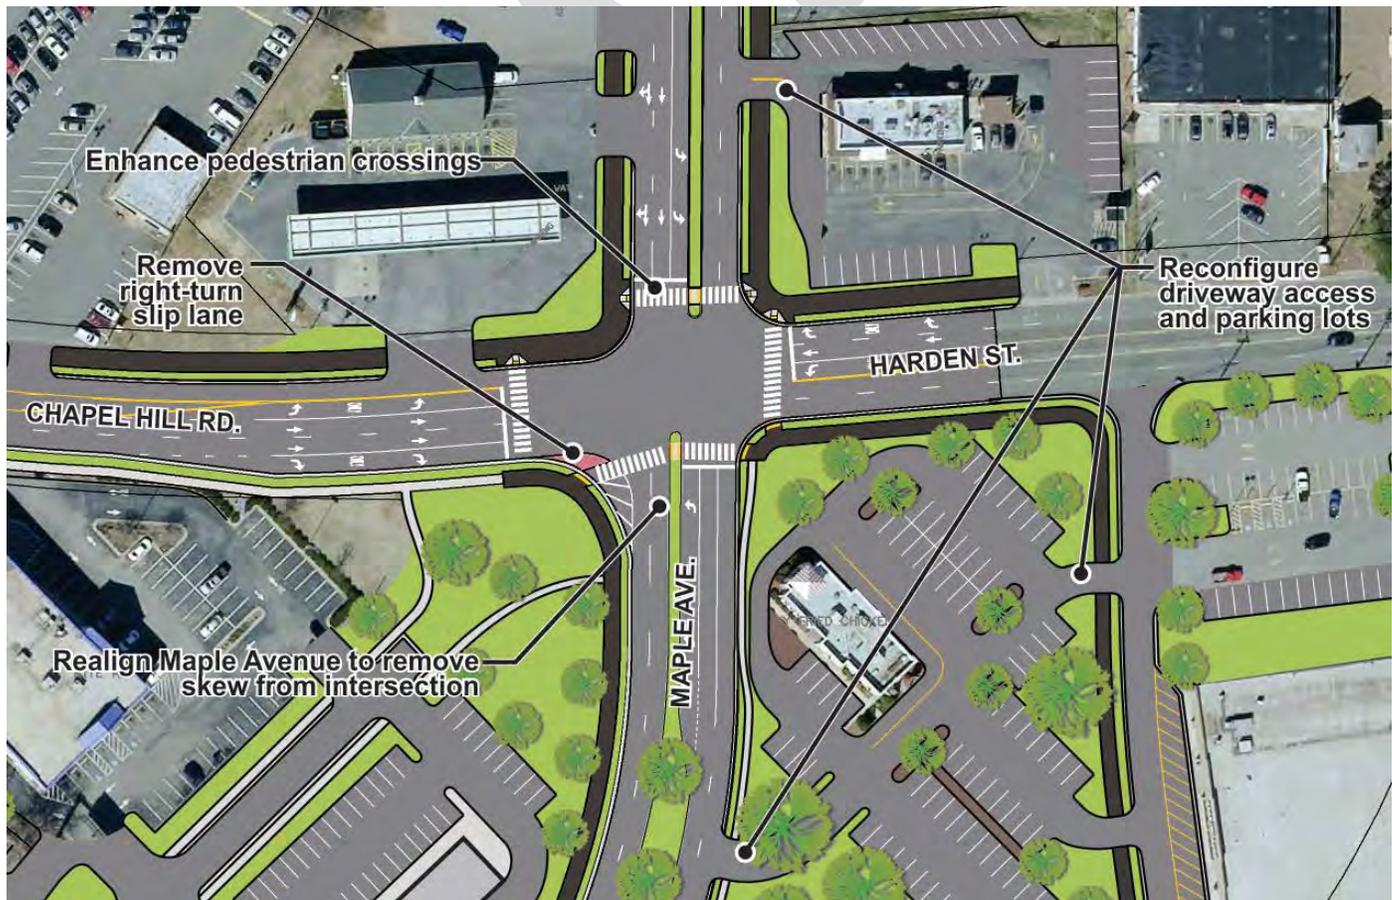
| Chapel Hill Road/Harden Street Intersection Recommendations
